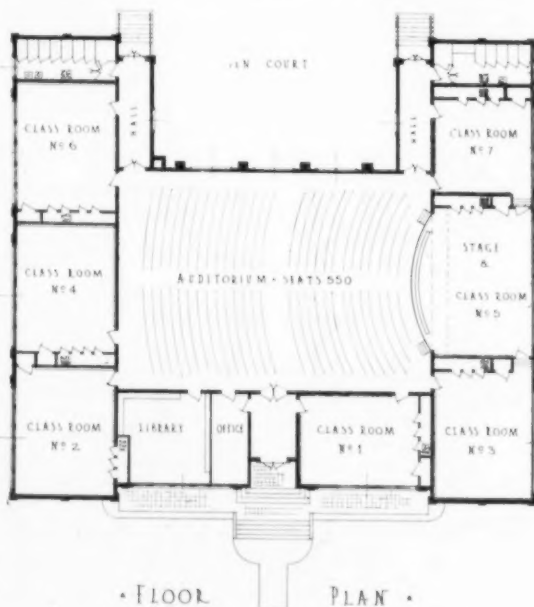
FLOOR PLAN OF SEVEN-ROOM SCHOOL BUILDING.
